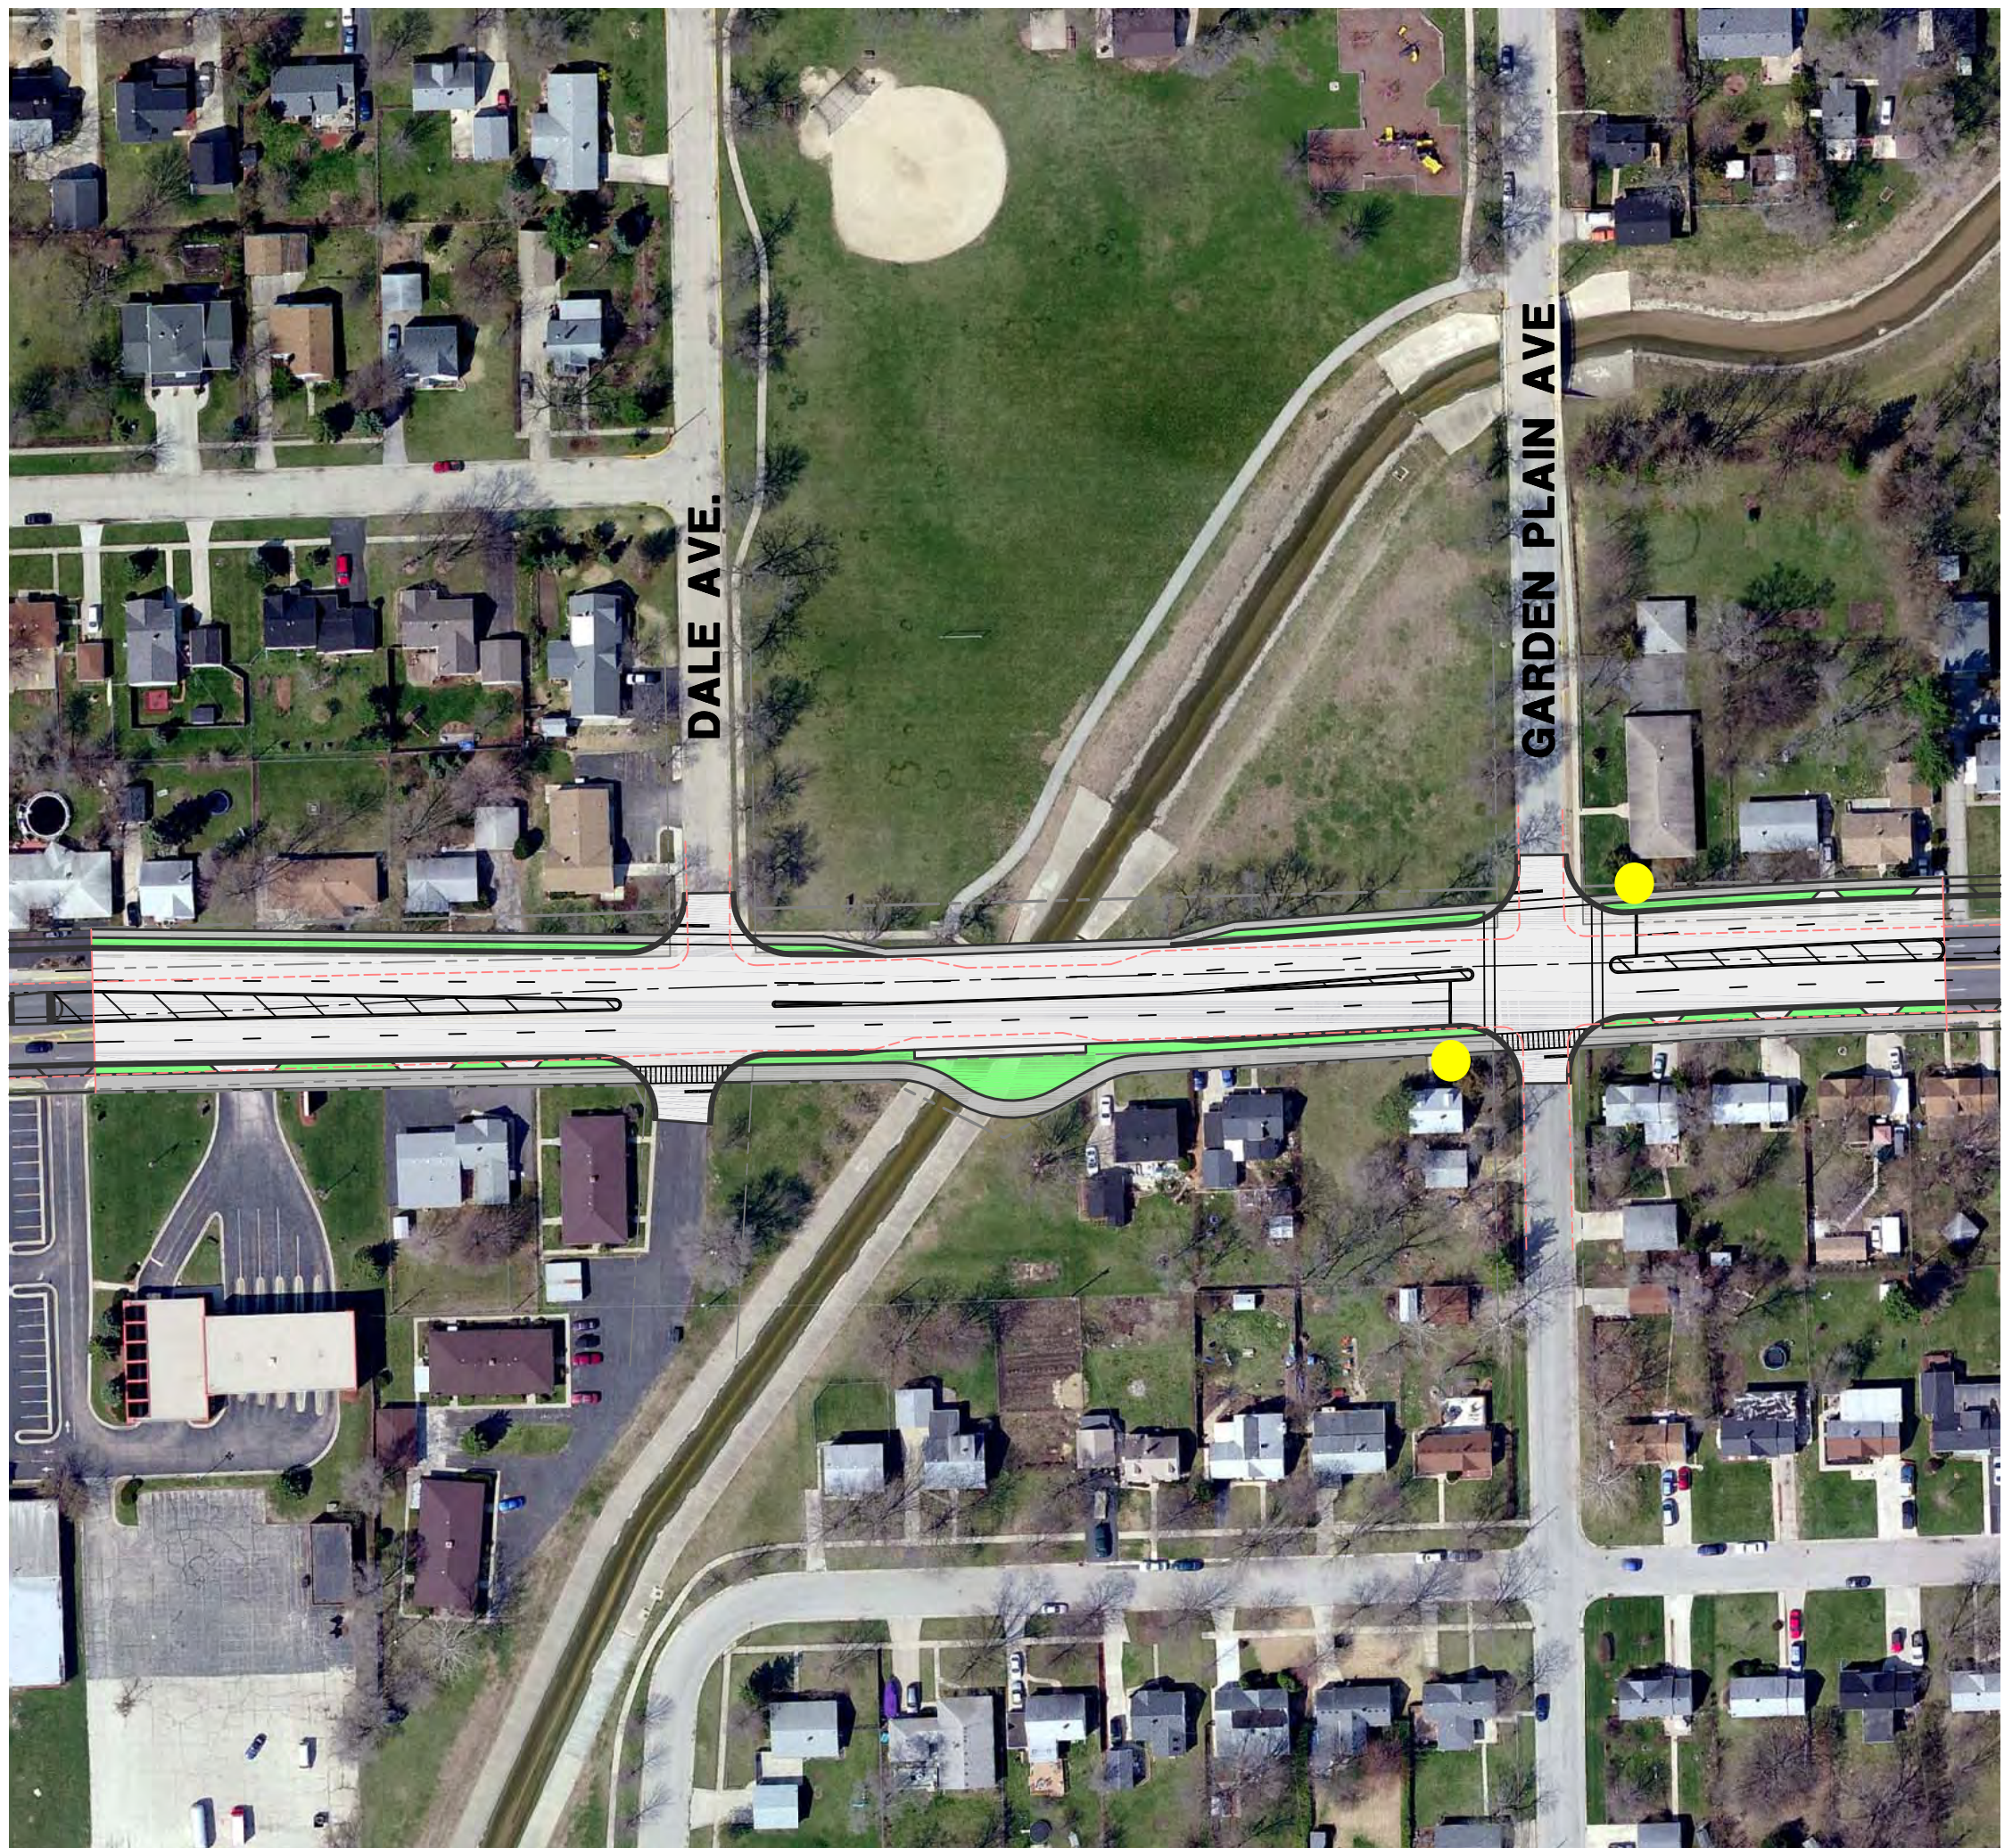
H-CORRIDOR IMPROVEMENT PLAN
